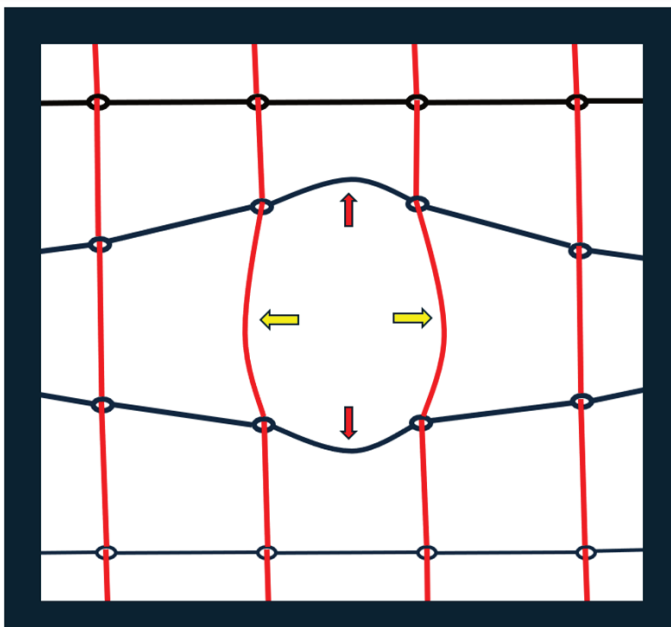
Grate made from horizontal pierced rod with vertical plain rod; Intersections between rods are not welded which enables forcing the rod to create gap big enough to an intruder to go through.
